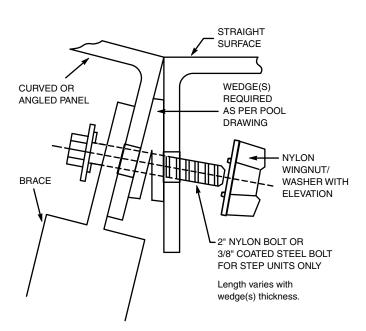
FIGURE O – Plan view of straight step unit bolted to radius spacer panel joint (typical)
